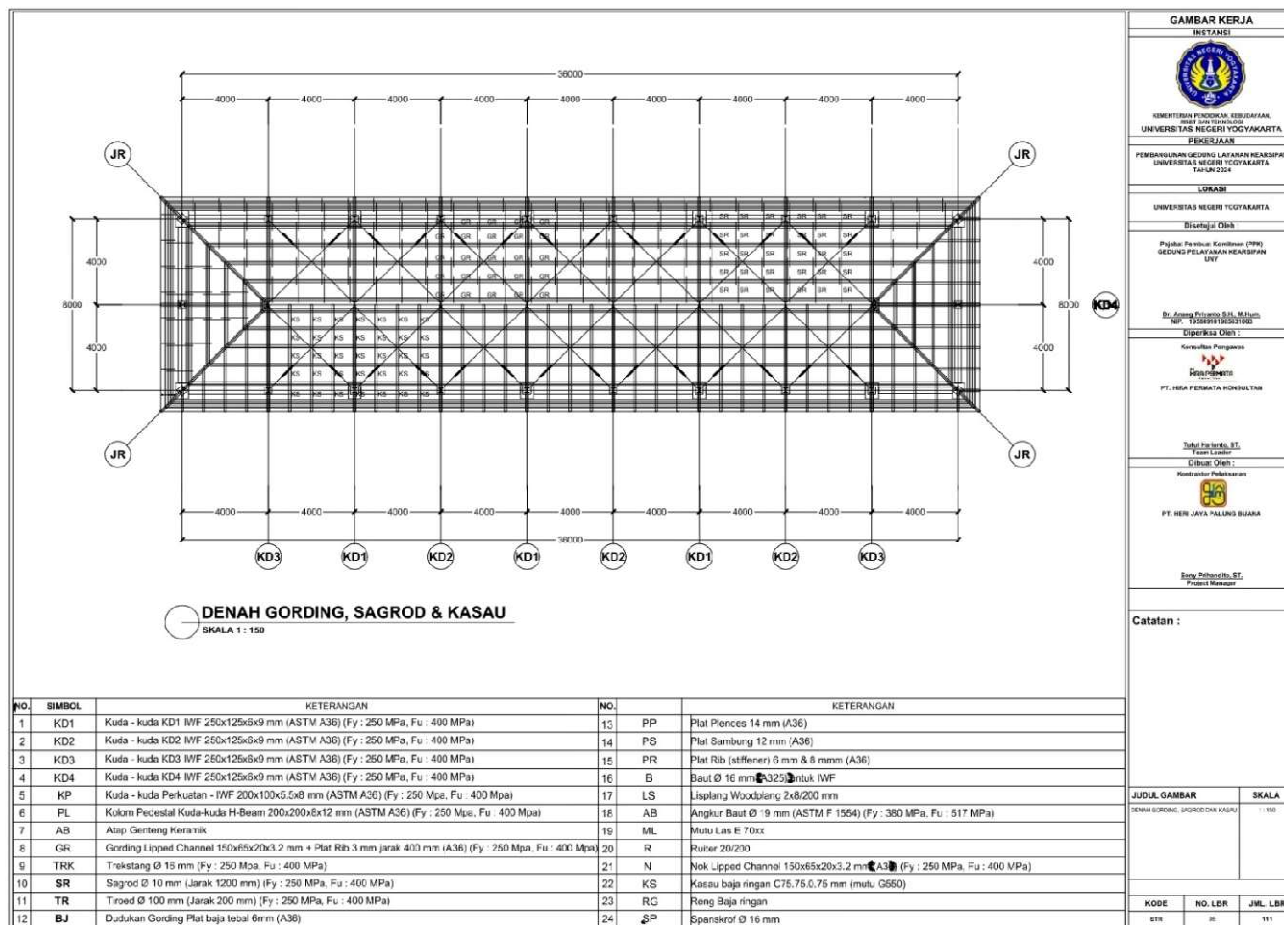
38 Purlin, Sagrod, and Rafter Plan
